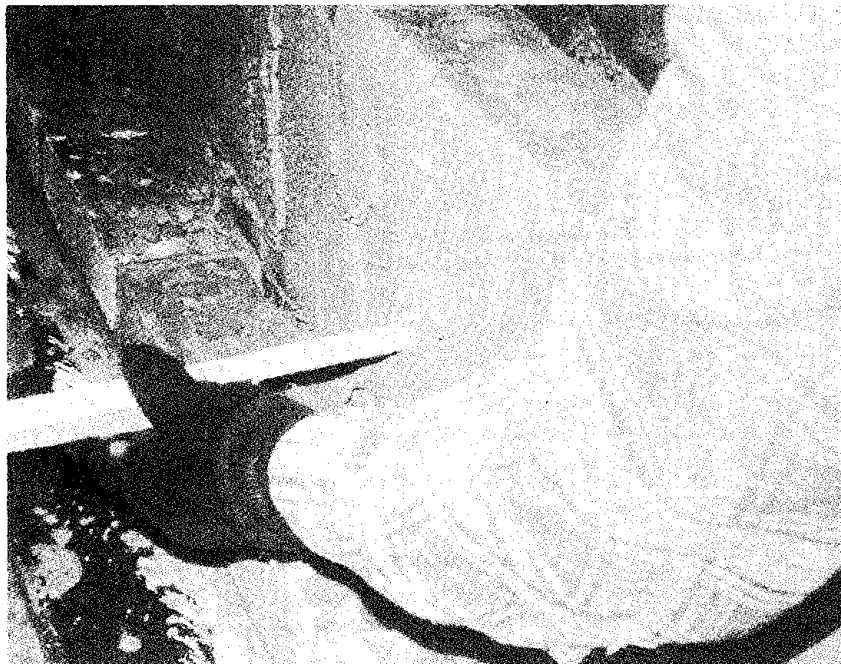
WALL SPECIMEN DURING CONSTRUCTION
